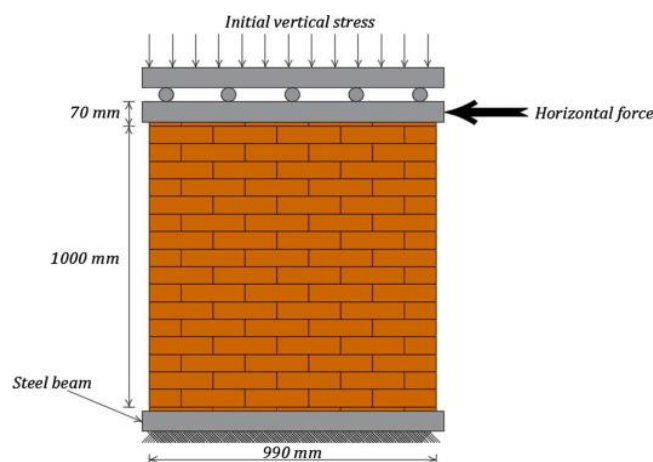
experimental testing setup to assess the shear strength of a masonry wall [93].
